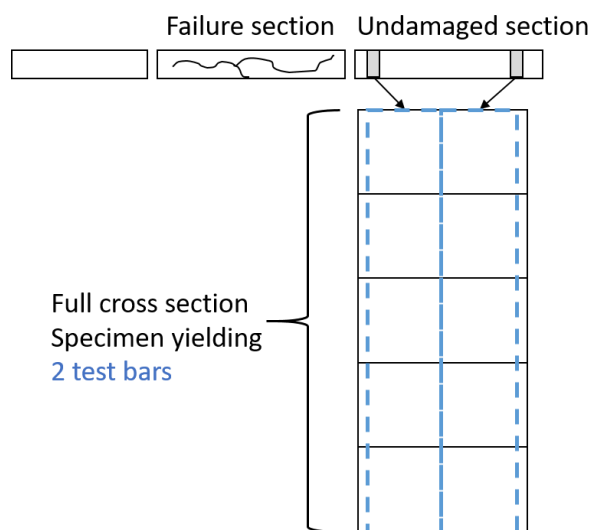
Glulam sections after bending test. Sections without bending failure were used for producing shear specimens.
